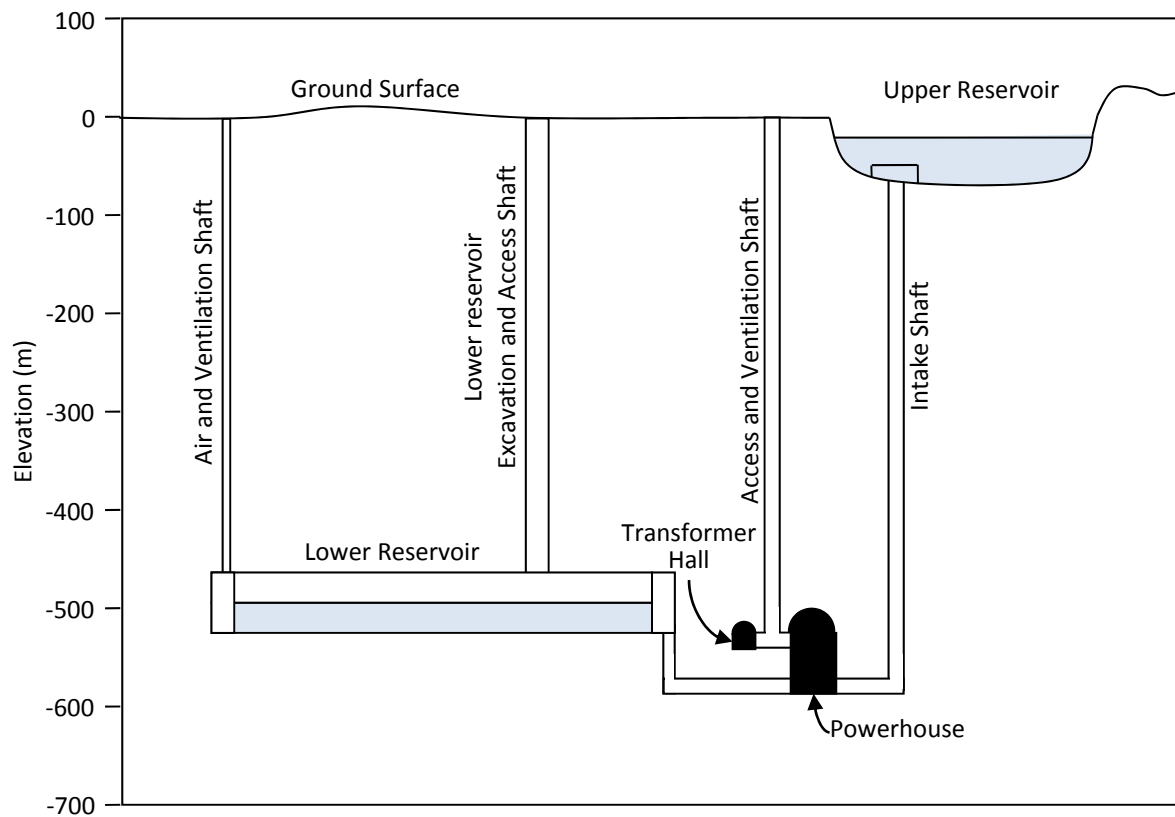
Proposed layout of an underground pumped hydroelectric storage facility [18].
